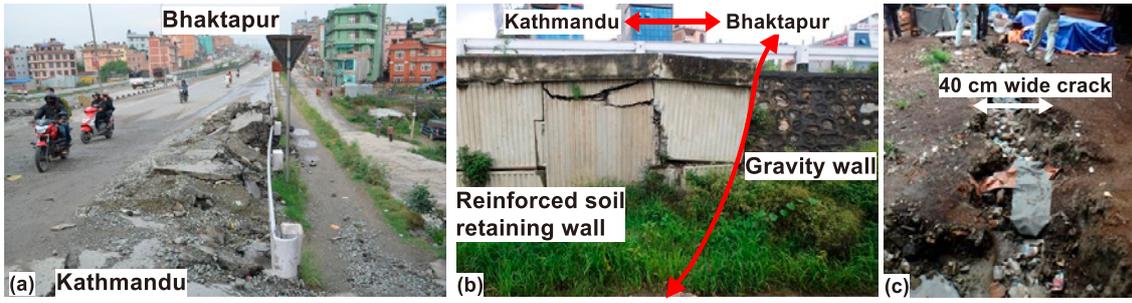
Nepal-JICA road (a) road subsidence (b) cracks appeared on reinforced soil retaining wall and (c) 40 cm wide crack appeared. A longitudinal crack appeared at the joint of two embankment walls and runs along the another side of the bridge. Photos of (b) and (c) are adopted from Dr. H. Nakazawa from NIED, Japan.
